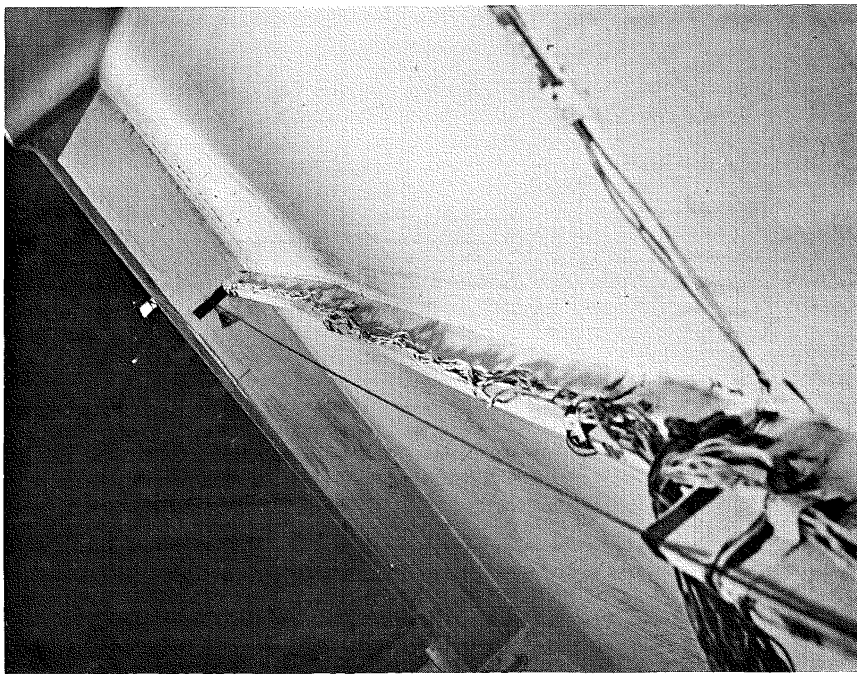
Buckled Longitudinal Stiffener in Girder LS3 after Test T1
